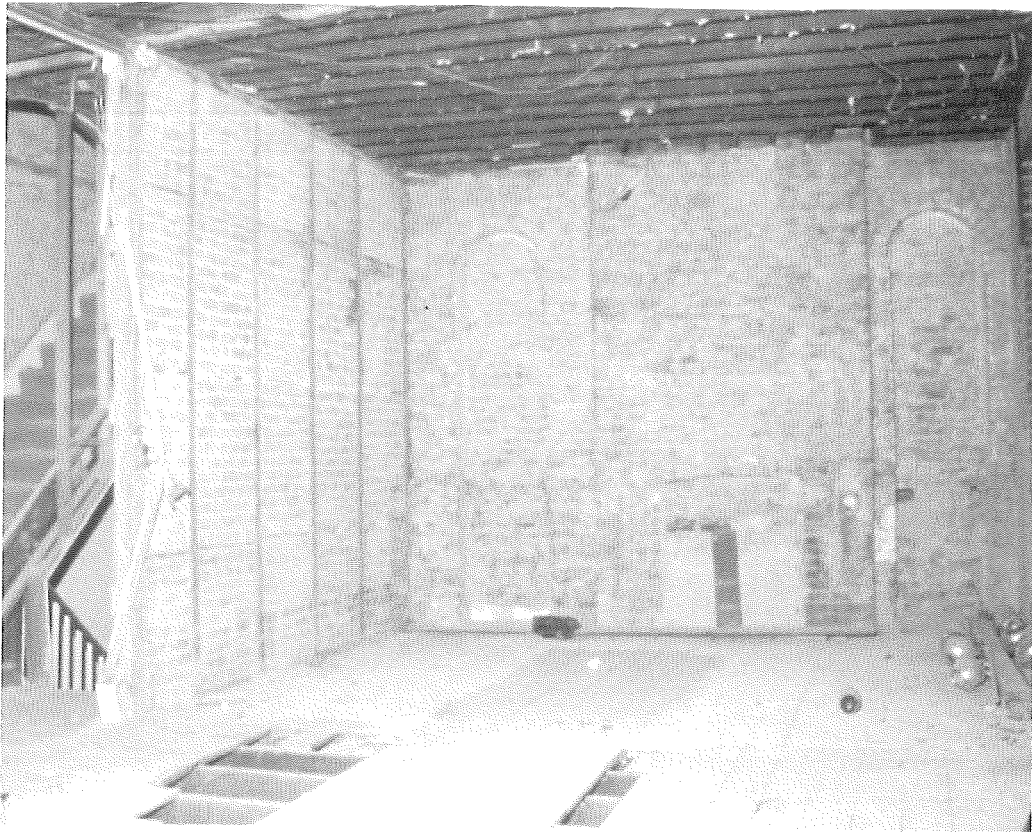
Interior, ground floor, looking towards staircase (southeast)
